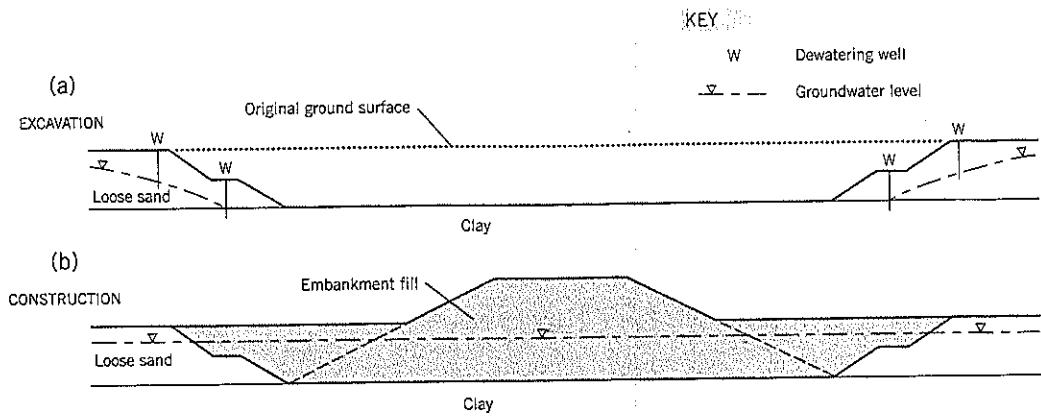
Excavation and replacement. Example of an embankment on a flood plain.
